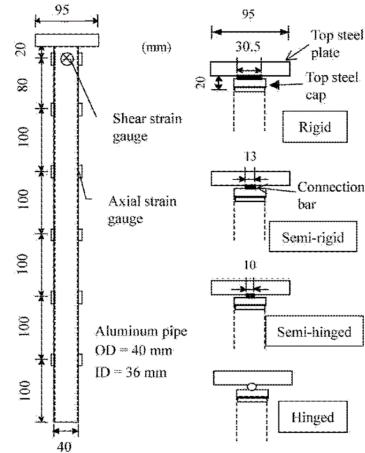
Model piles with different pile head connection conditions (Matsumoto et al., 2010)
